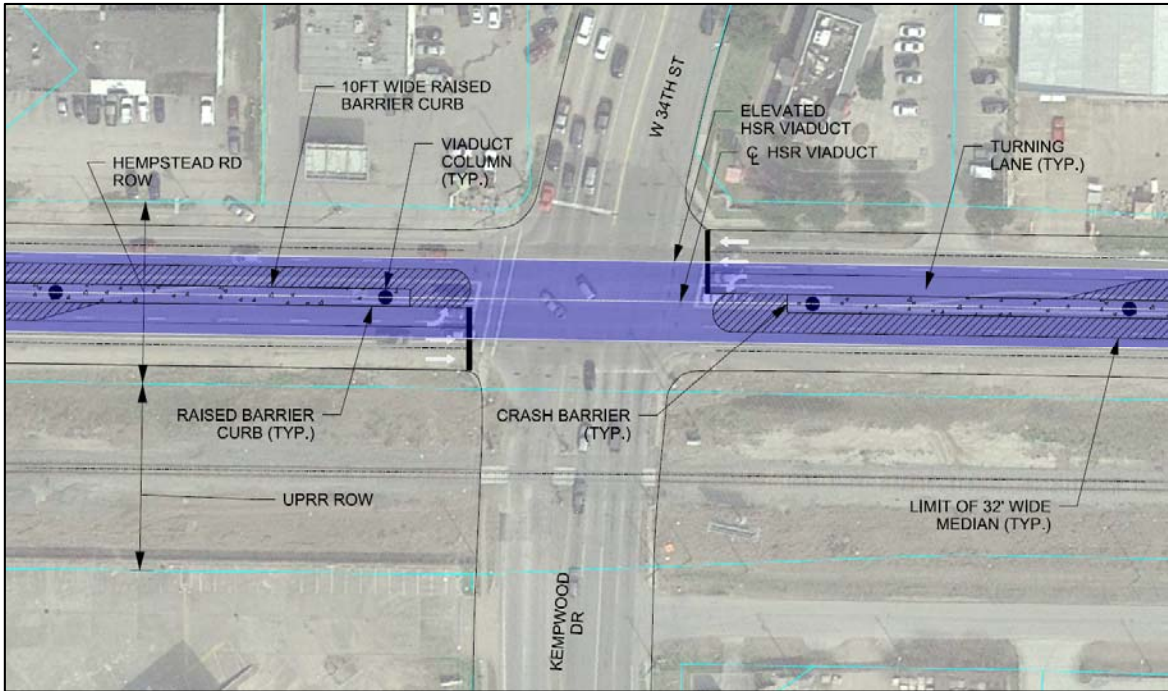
Conceptual Roadway Configuration Plan at Intersection of Hempstead Road and Kempwood Drive/W. 34th Street
